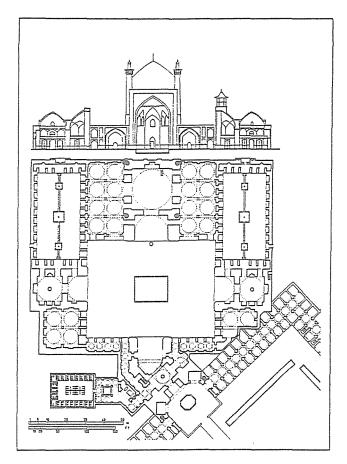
'Imam' mosque in Isfahan, plan, section and façade, proportion between dimensions of architectural elements on the plan, section and façade, repetition of domes and arches on the plan, symmetry on the plan and façade, centrality in the centre of all courtyards, good order, movement and tranquillity between the entrance and the main courtyard on the plan, culmination by pools on the plan, highest point(s) of the top of the dome and minaret on the façade (S. G. D. I., 1978)
